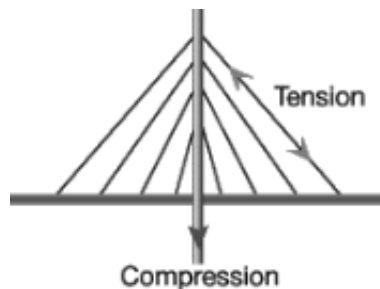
Tension in the cables and compression in the tower of a cable-stayed bridge (Morrissey, 2000)
